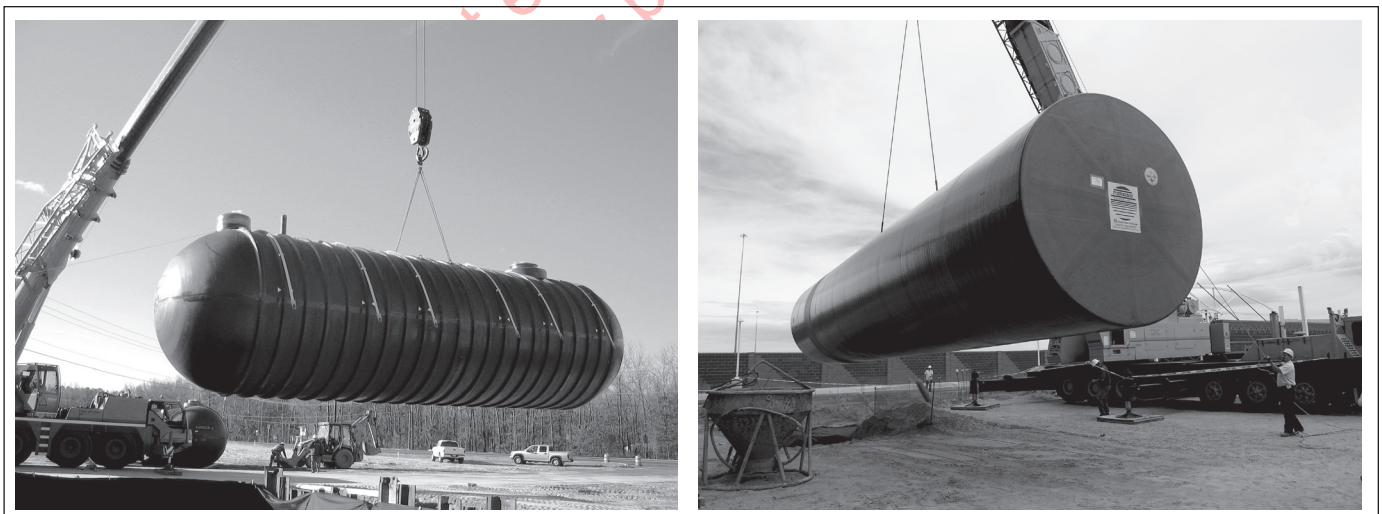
Underground tanks are large cylinders typically made of fiberglass (left picture) or corrosion-protected steel (right picture) buried horizontally in the ground. Monitoring fuel storage systems to be sure that they function properly and do not leak is an important responsibility for everyone involved in operating and maintaining these systems.
